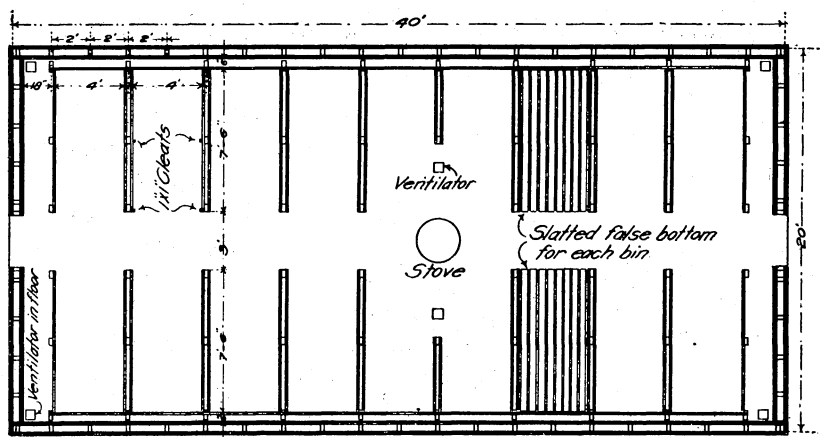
Ground plan of a good type of sweet-potato storage house.
